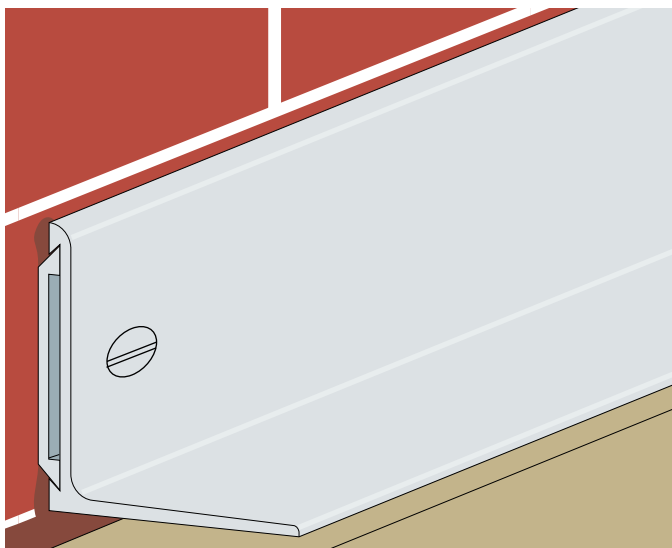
Detail shows how a 2" x 2" x 1/4" angle (see page 98) may be used as an expansion joint cover for floor to wall applications.
